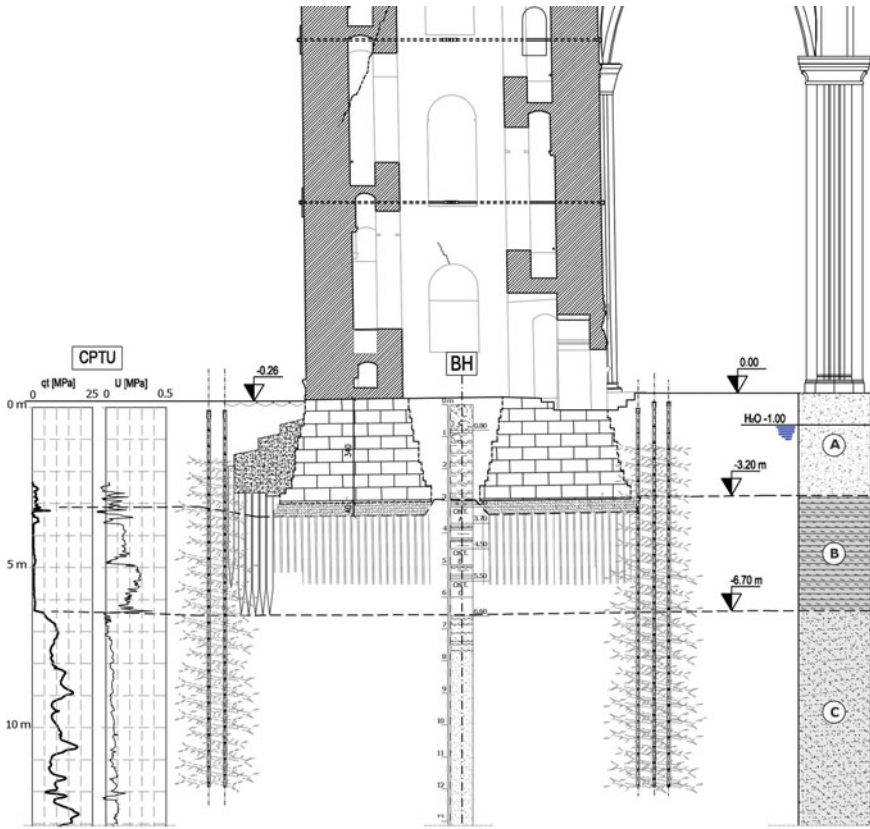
Schematic section of the tower foundation and of the relevant subsoil along SE-NW direction, with the in-situ test logs, the strengthening intervention of 1904 (on the left-hand side of the foundation) and the Tubes à Manchettes (TAMs) of the new fracture grouting intervention
